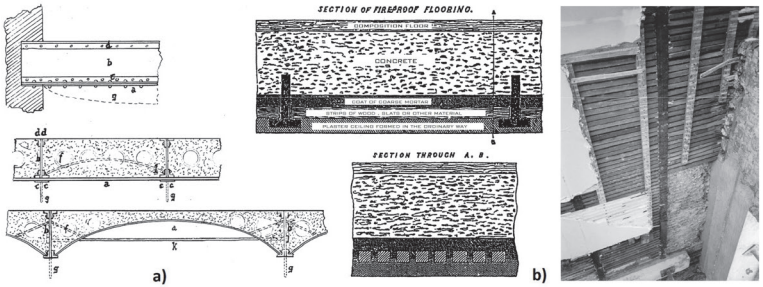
a) Suspended floor by Nathaniel Beardmore [2]; b) Suspended floor with cast-iron beams by Fox & Barrett [3]
